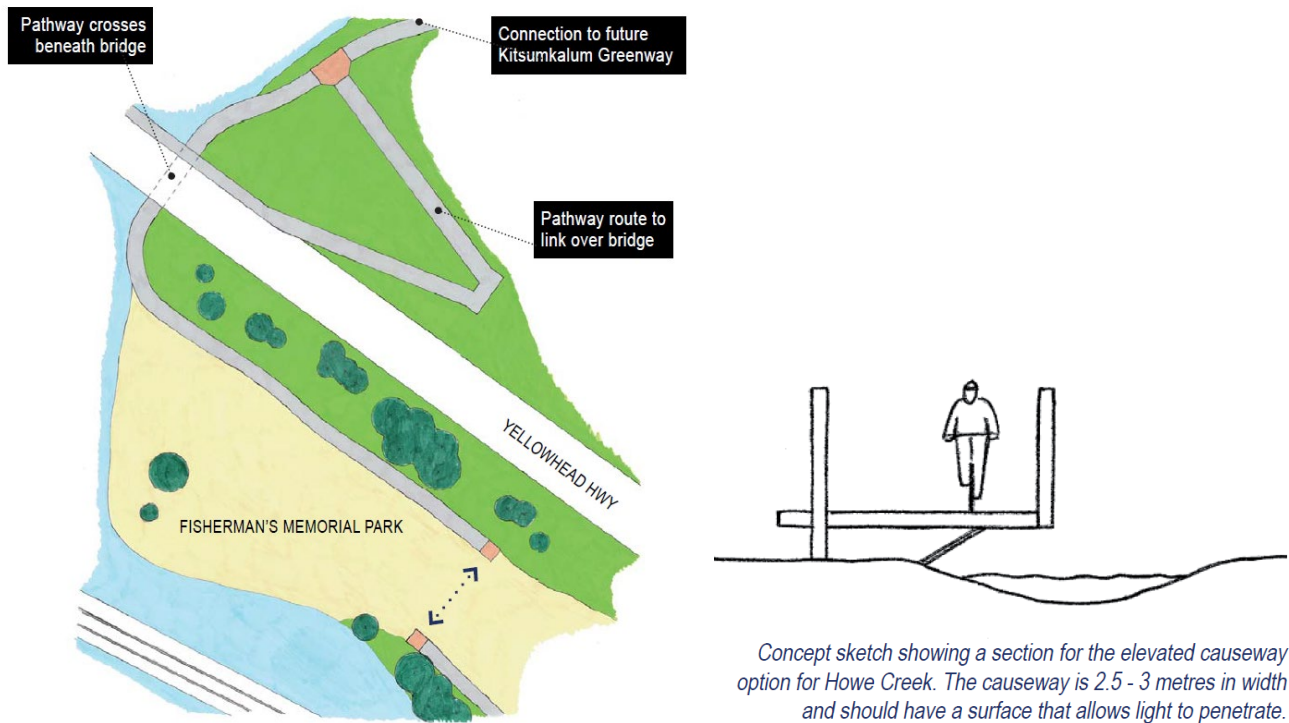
Conceptual sketches of Kalum River Bridge area and elevated causeway (Boulevard Transportation Group Ltd., 2008)
